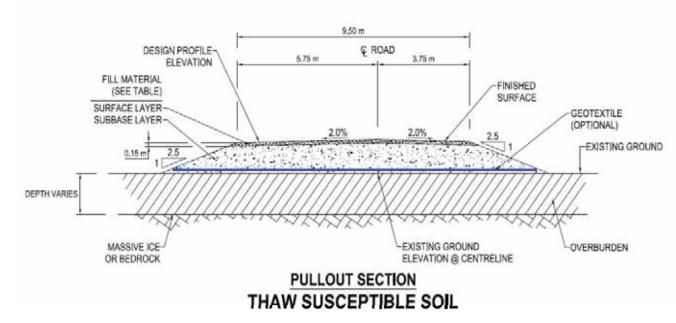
Typical Road Cross-section at a Passing Turnout for Areas Over Thaw Susceptible Soil
